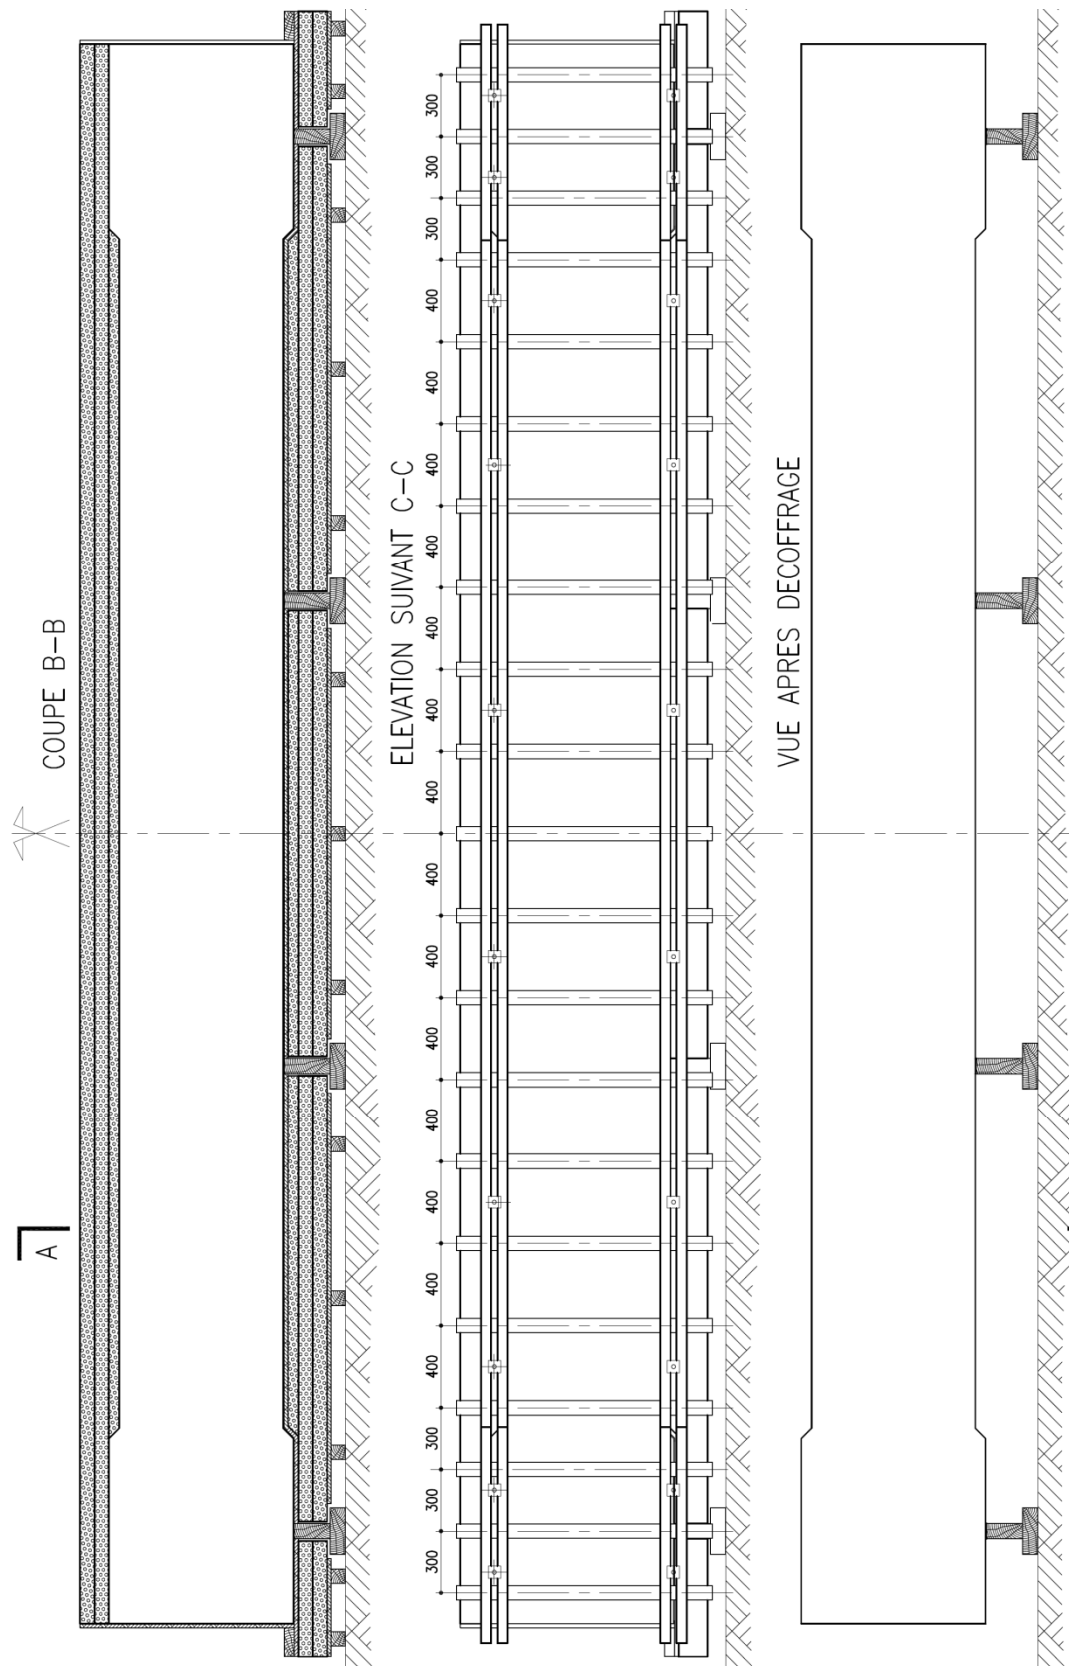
Formwork and thermal isolation (ConCrack website 2010)
